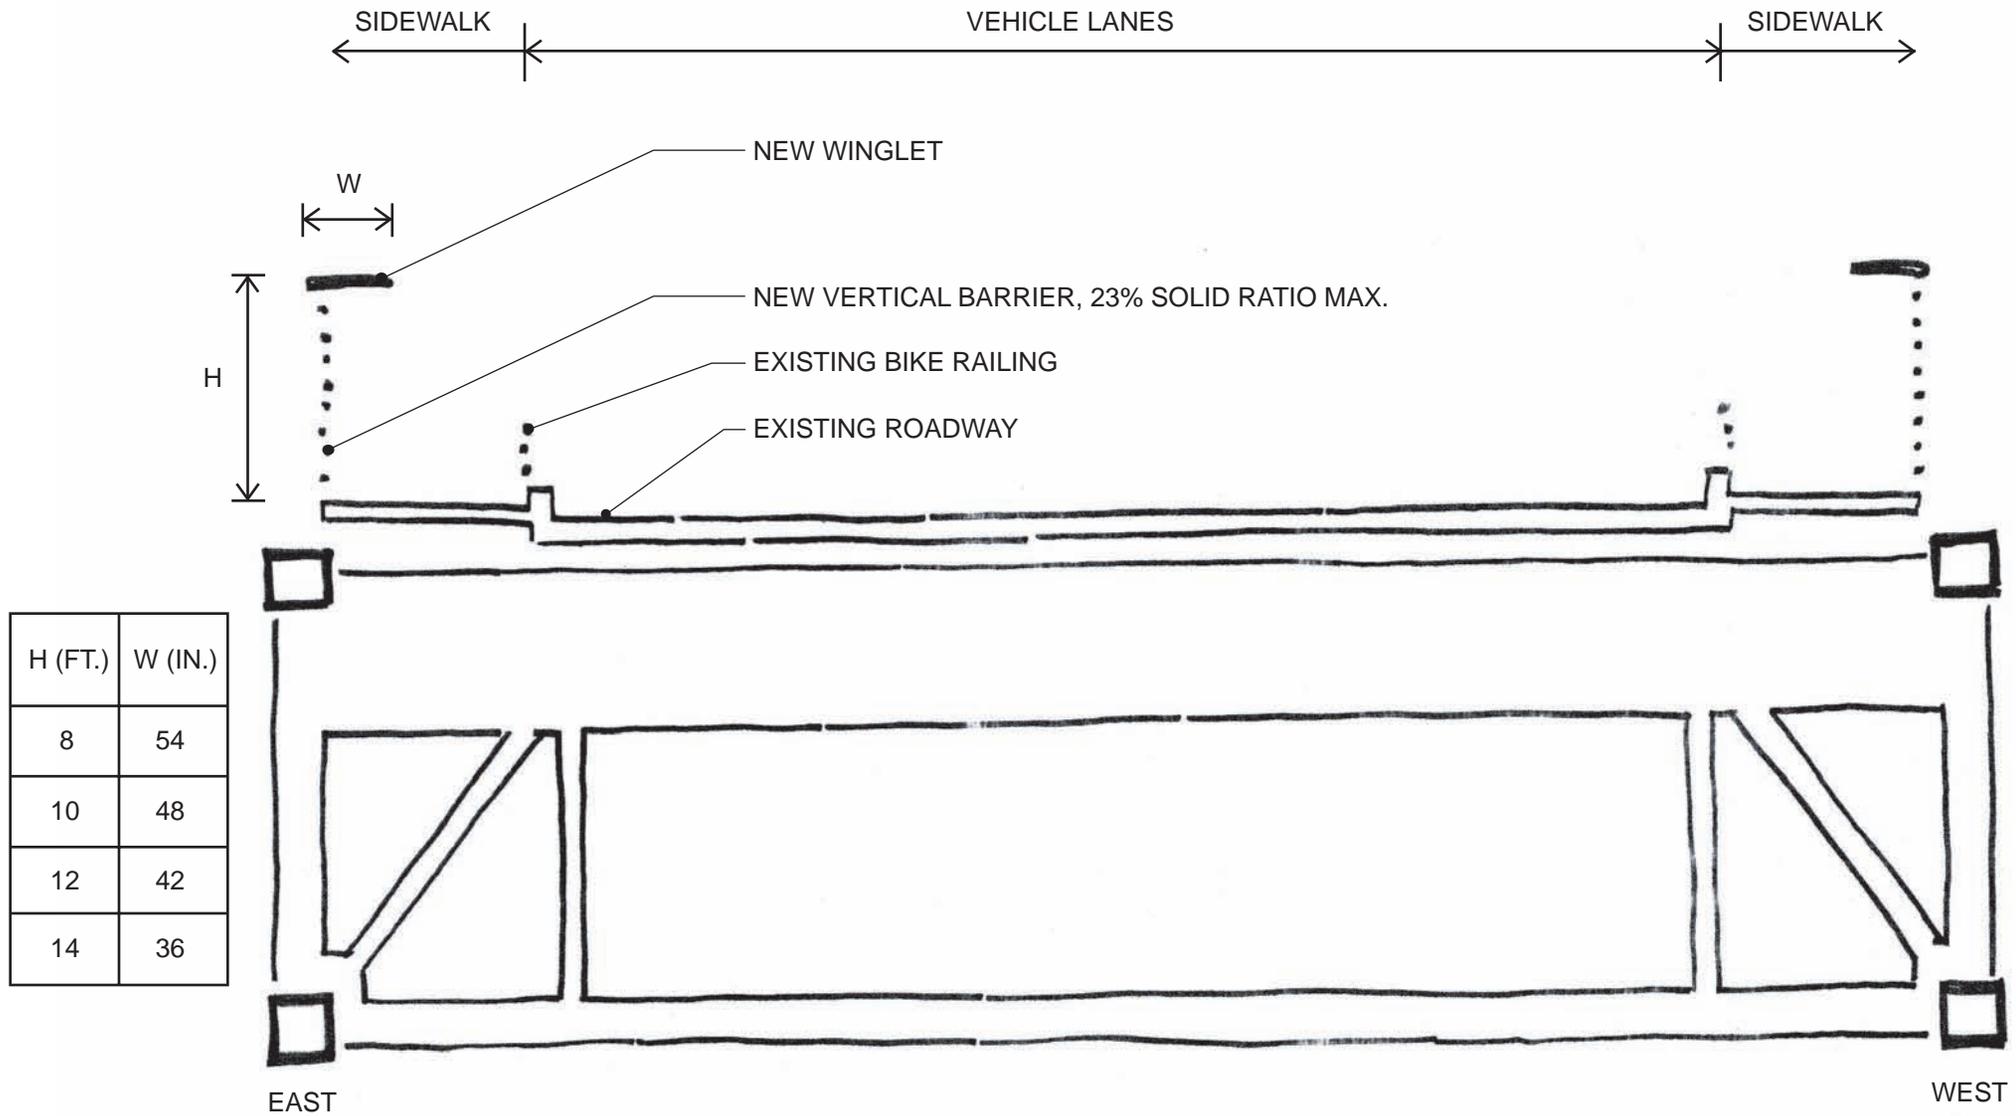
CONCEPT 2 : REPLACING THE EXISTING RAILING ; WINGLETS MOUNTED OVER BARRIER
